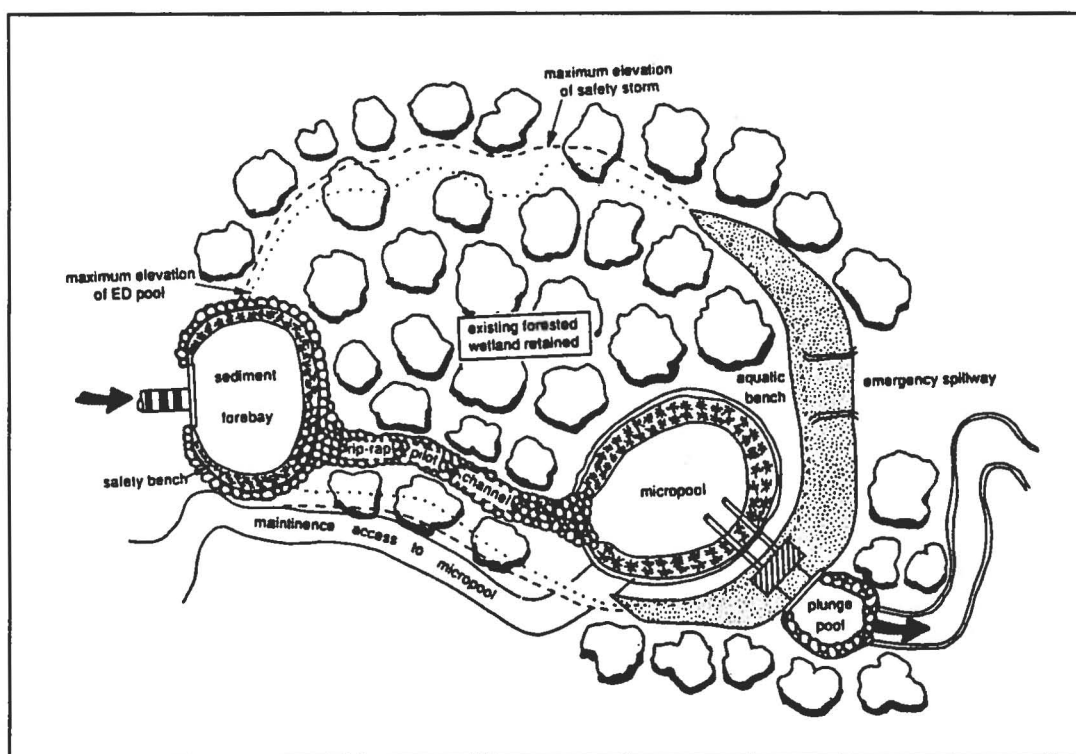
Schematic design of an enhanced dry extended detention pond system
